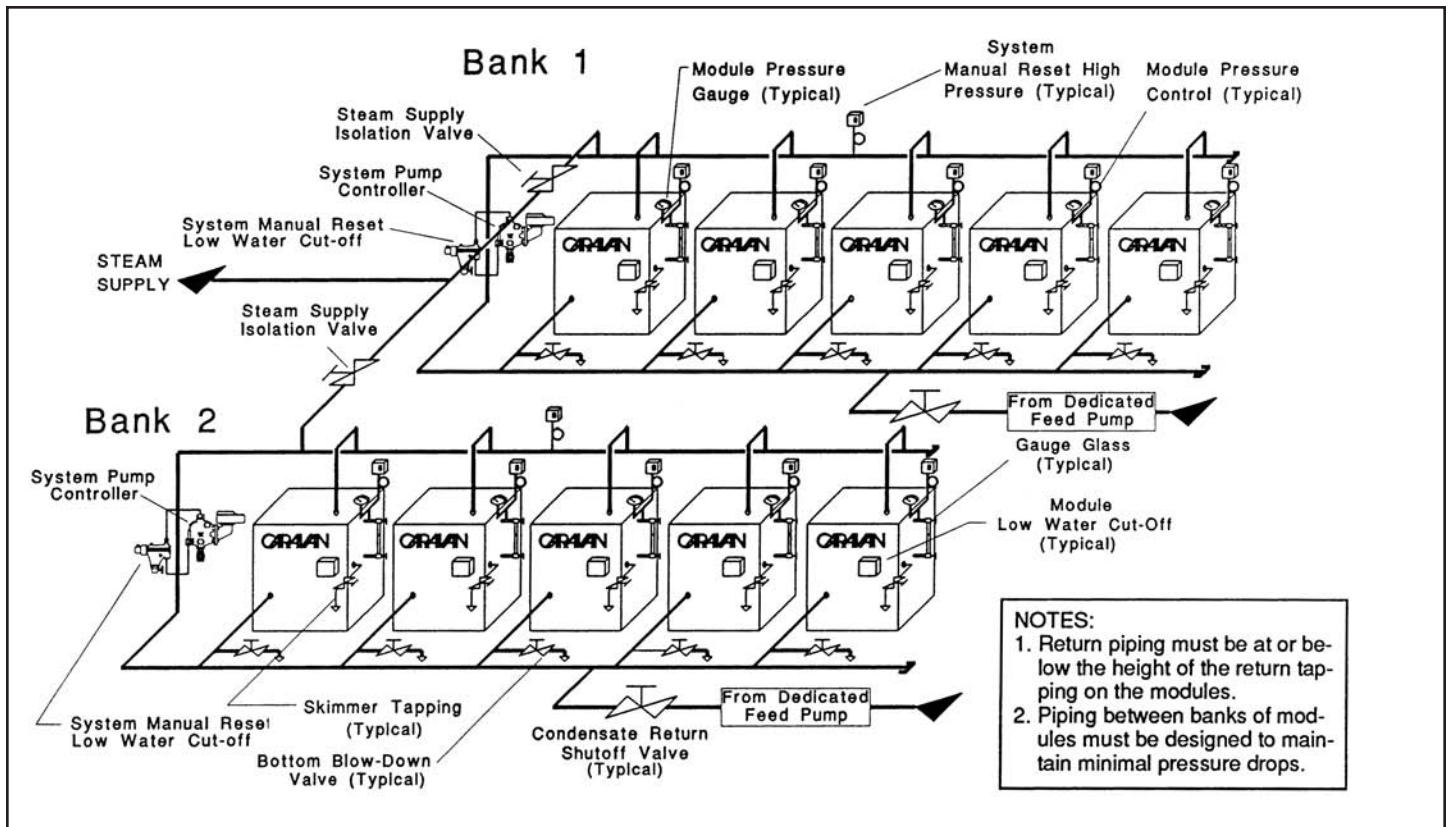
Steam modules, isolated banks (Note: For detail piping refer to pages 8 & 9)
